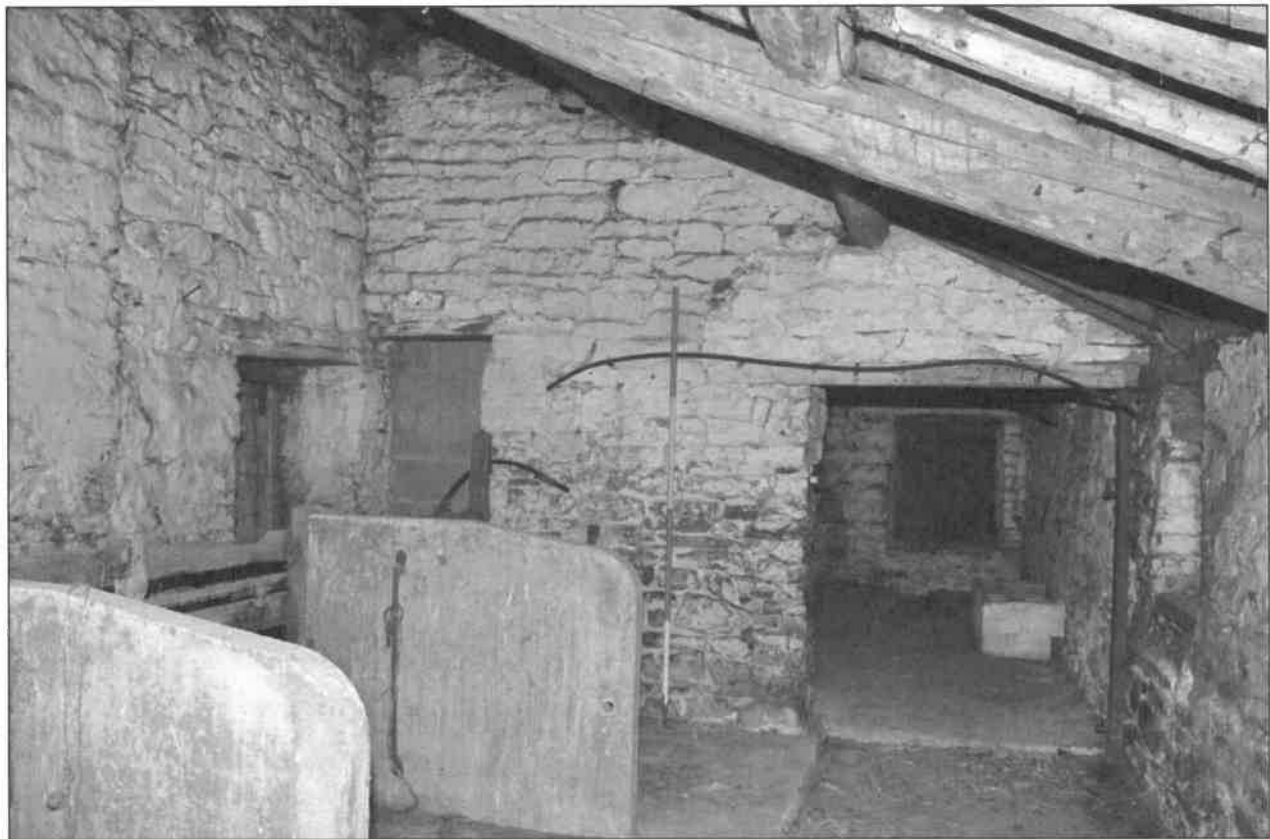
Outshut on north side of barn: interior of central unit, looking west
